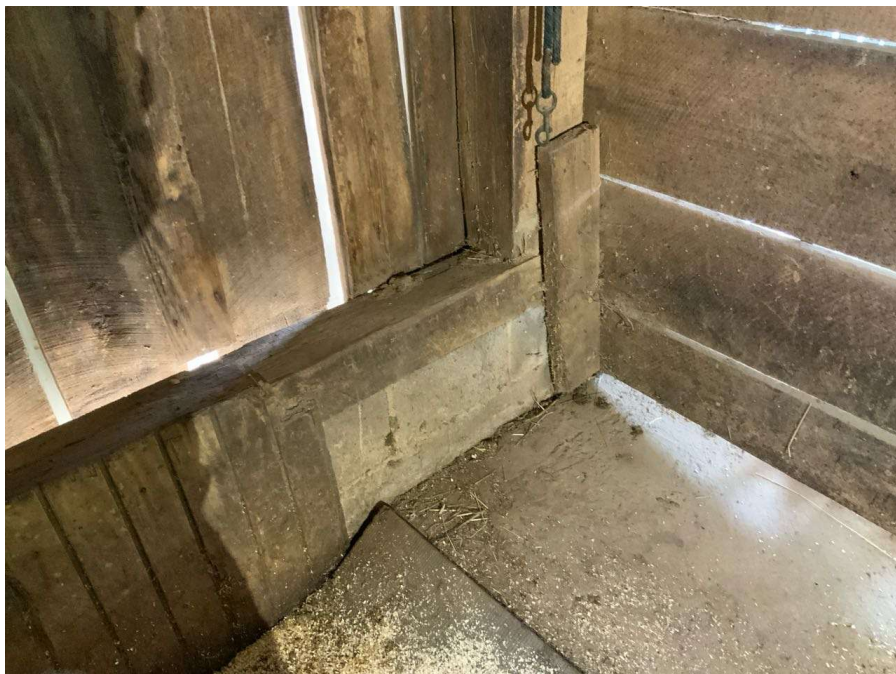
General view of a perimeter grade level column supported by timber sill plate and CMU foundation wall. Column B/1 shown looking northwest.
